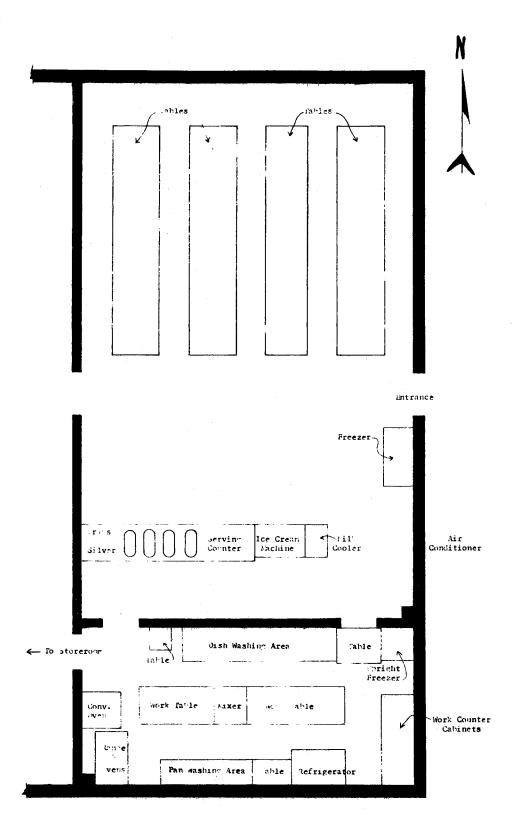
Shawnee, Washington Elementary School Cafeteria and Kitchen Layout
